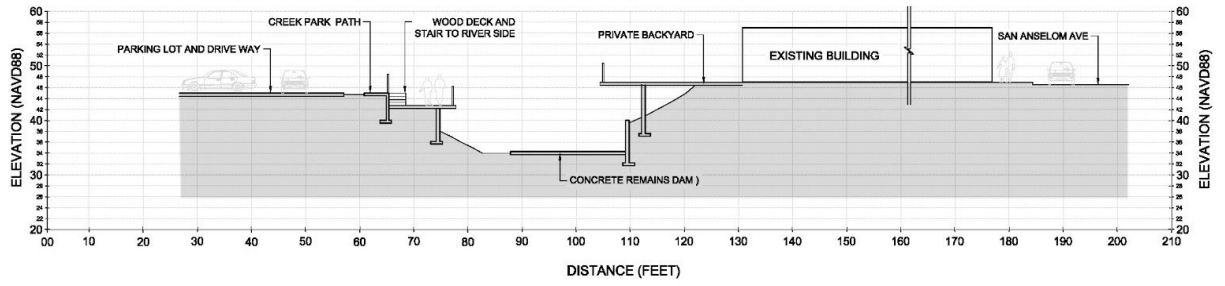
Cross Section A (Treatment after demolishing the bridge building))
